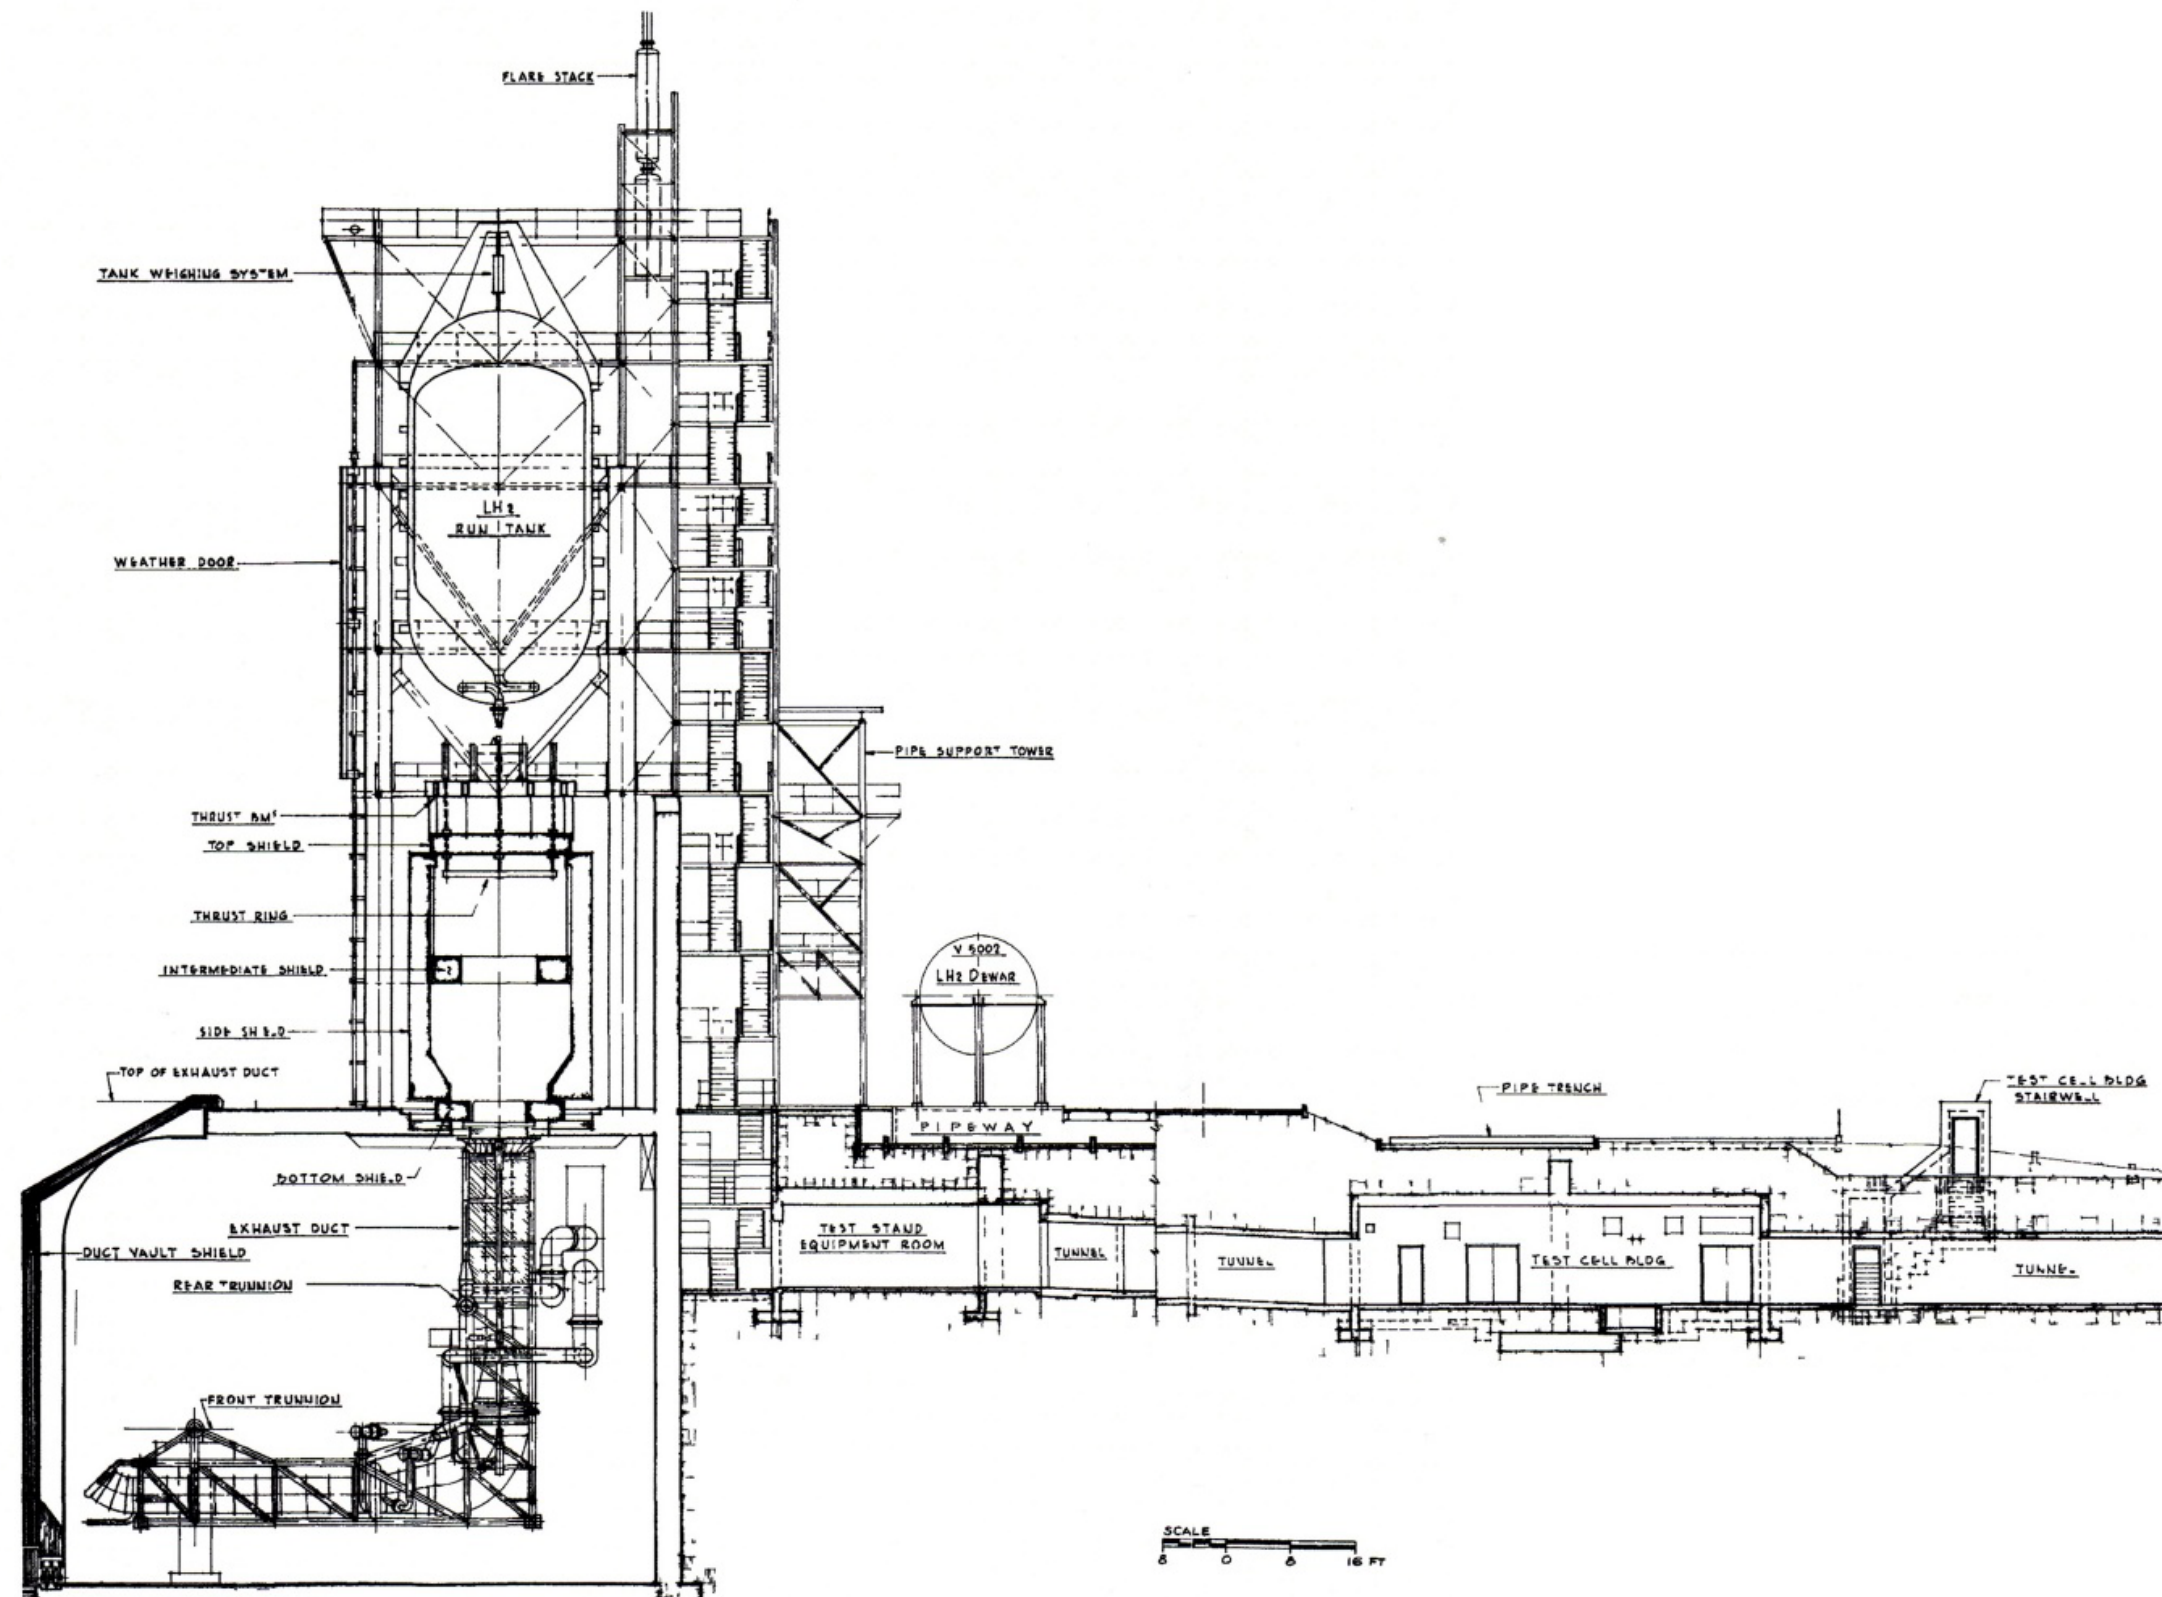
Sectional drawing of the ETS-1 Test Stand showing the underground Duct Vault, Equipment Room, Test Cell Building with its stairwell, and portions of the Access Tunnel (drawing on file from unknown source).
